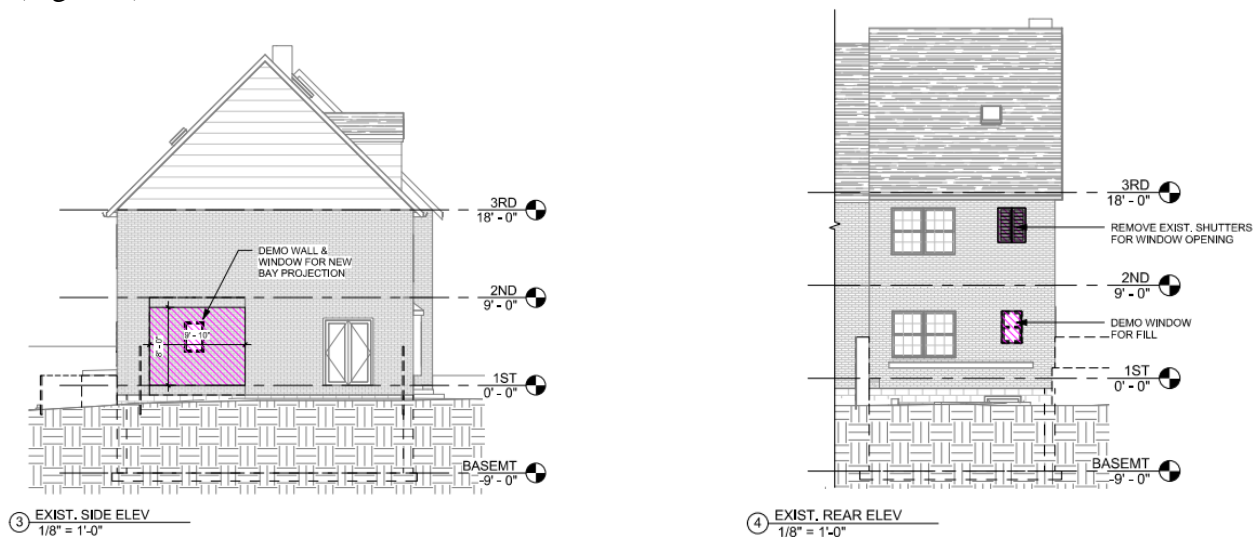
View of existing side and rear elevations showing the proposed demolition and encapsulation.
